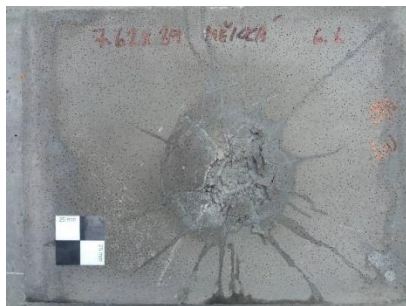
Tearing of material from the back side of the board due to tensile stress
